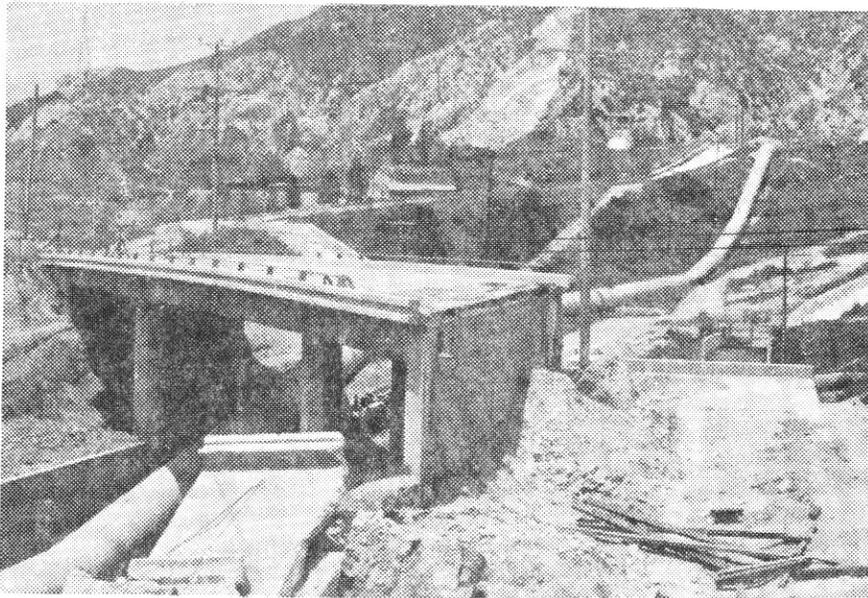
Looking northeasterly at Bridge 53c-316 which carries Foothill Boulevard over the penstock. Immediately to the right of the bridge, the uncovered deck of the aqueduct structure, Bridge 53-1011, is visible.
